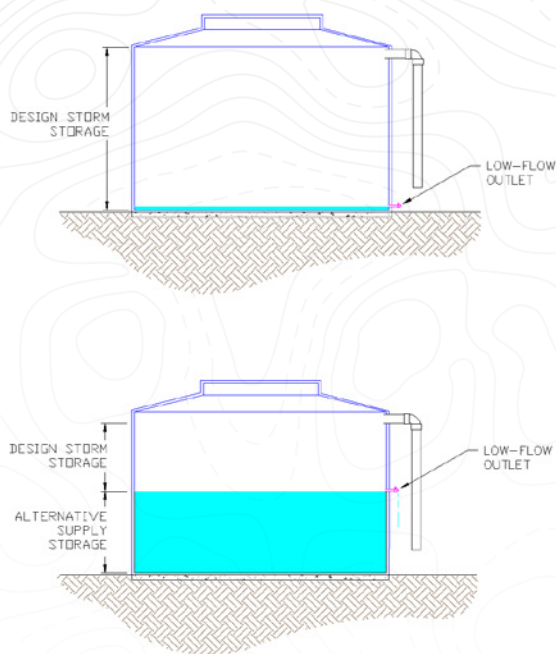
(left) . Top: a flow outlet is placed to provide equal parts detention storage and storage for alternative use. Bottom: placing the low flow outlet at the bottom of the cistern ensures maximum design storm storage
